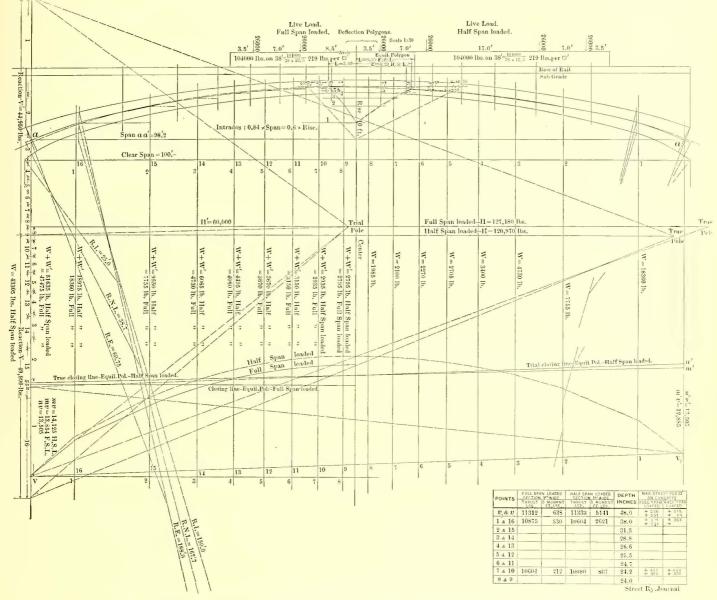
STRAIN SHEET FOR PROPOSED 100 FT. SPAN CONCRETE BRIDGE-NEW YORK & PORTCHESTER RAILWAY
